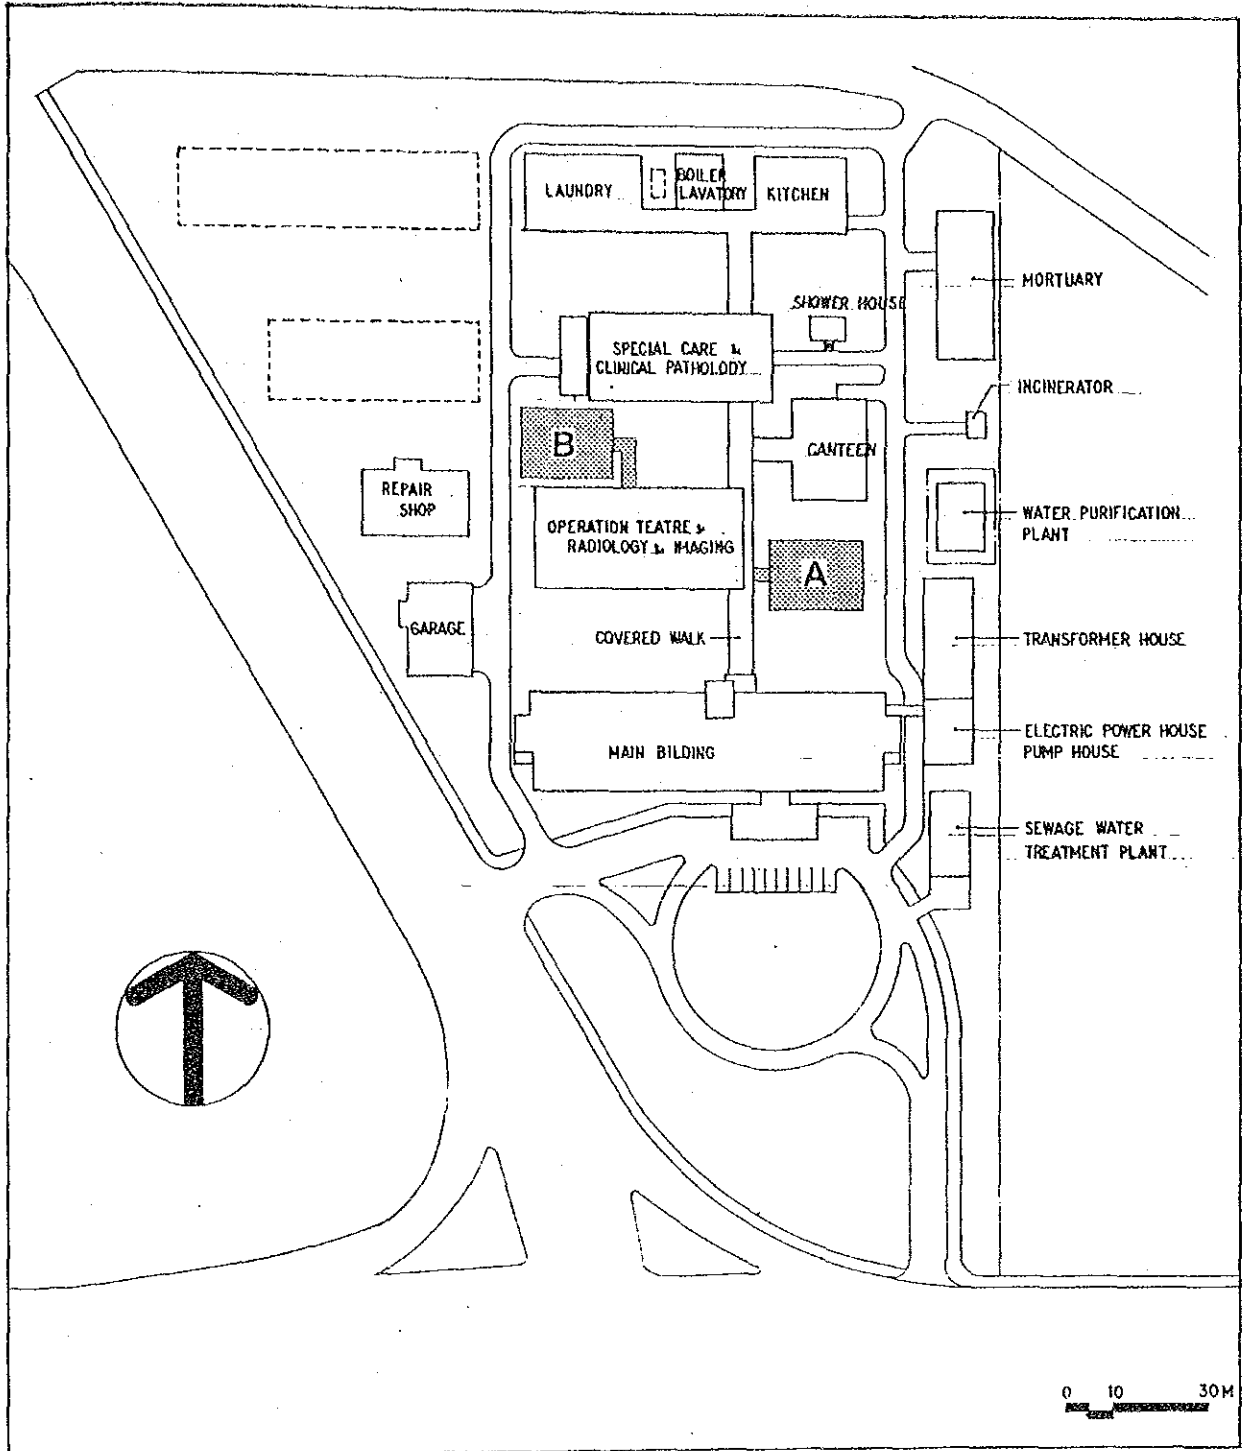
INSTALLATION PROPOSAL PLAN
